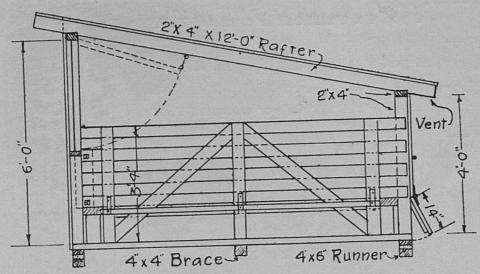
Two Pen Hog House, plan C 6-74-1, cross-section of framing.
